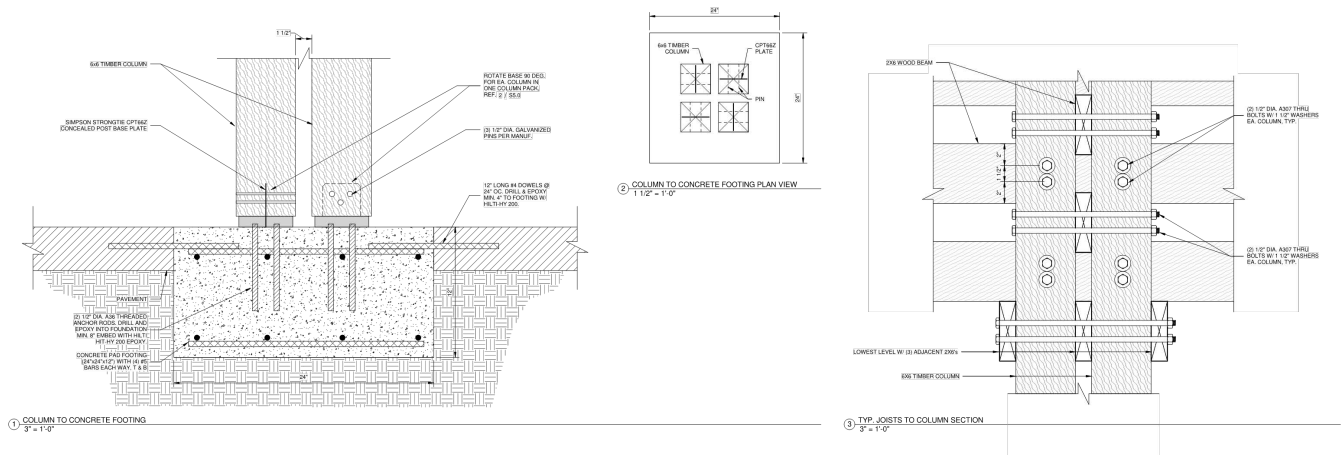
The Modular Farmers Market Structural Framing Connection and Details
